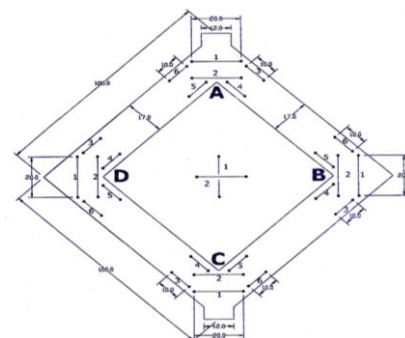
Frame with position of demec gauge targets around typical joint (All dimensions in cms)
